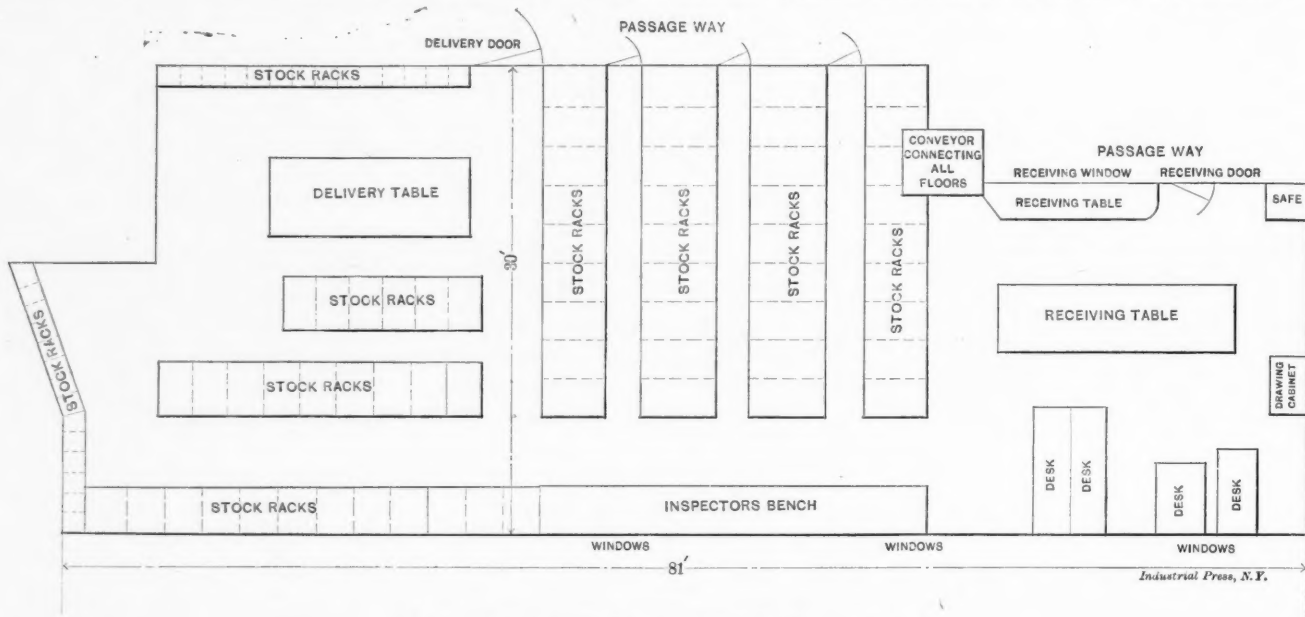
Plan of Inspection Department, Garvin Machine Co.
